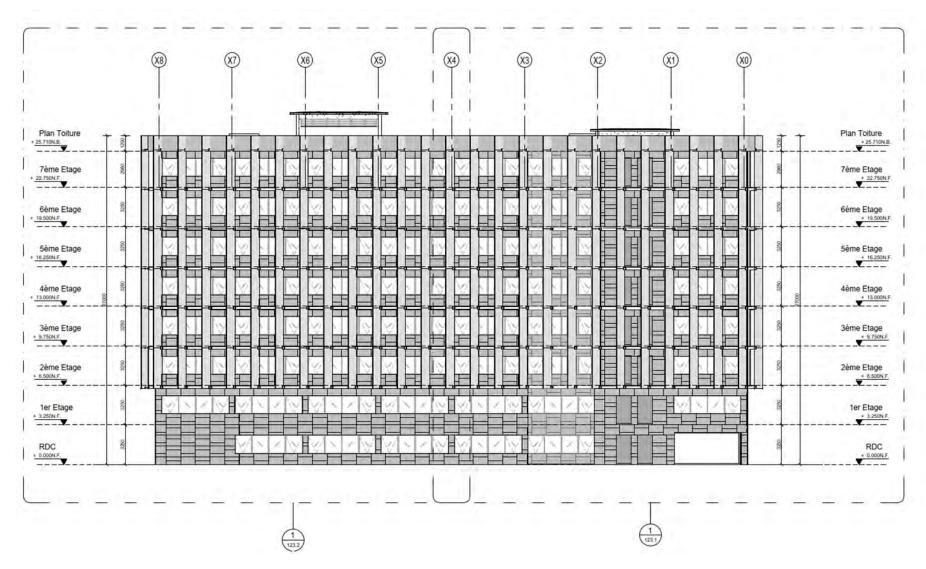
Façade drawing of a typical building (Source: ACC)
